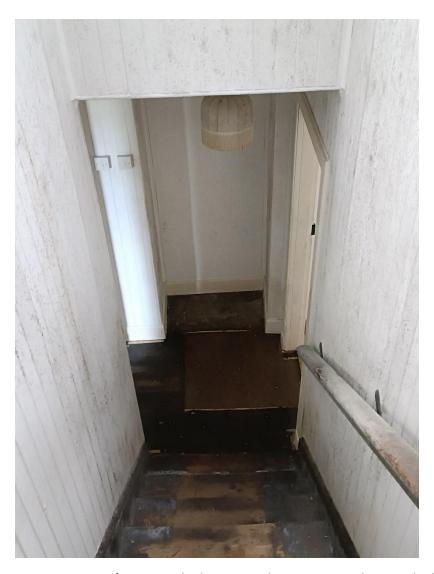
View from stairs looking towards room GF9 with D9 to the lefthand and D10 to the righthand side
